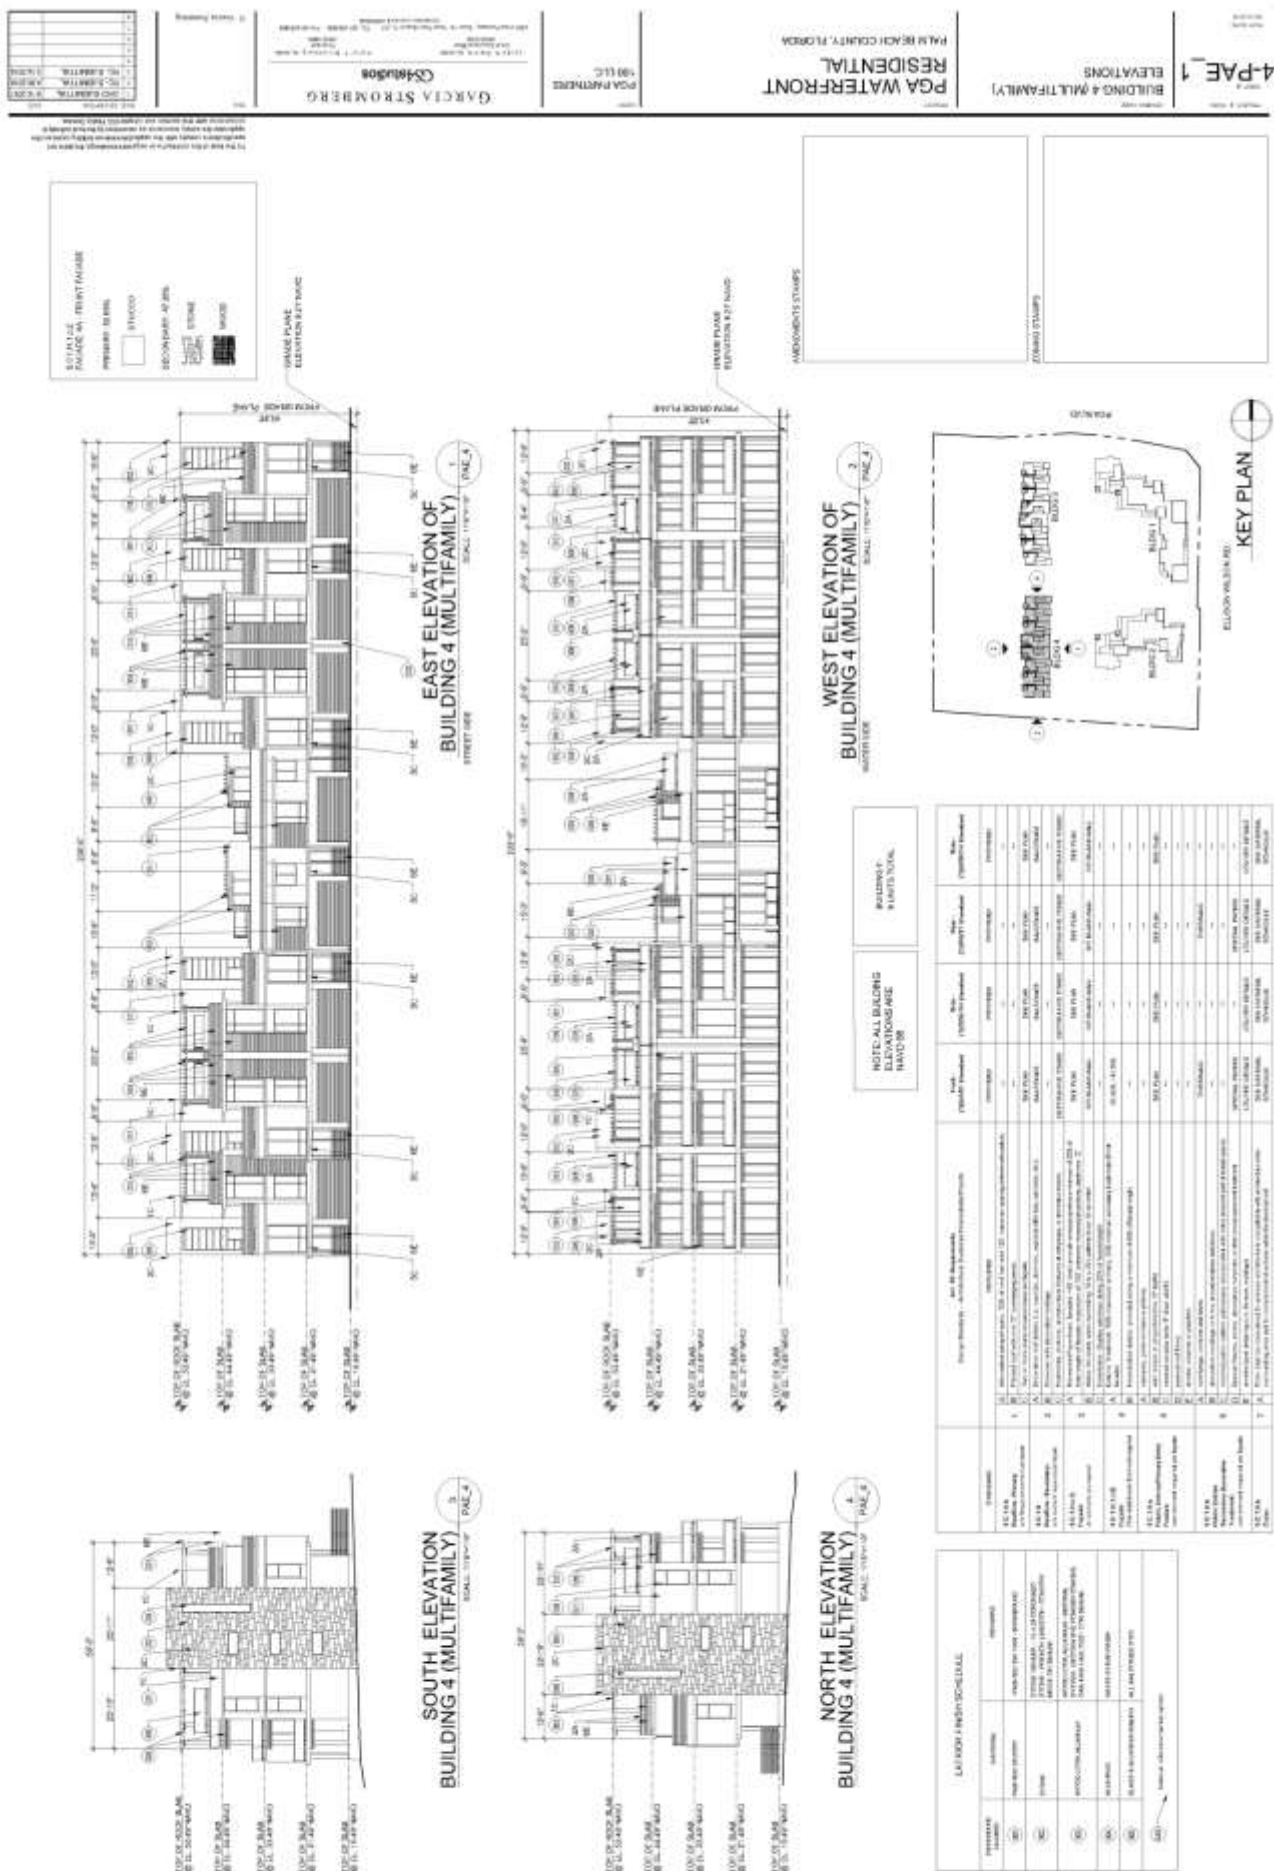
Architectural Elevations Dated May 14, 2018 (Page 2 of 4)
